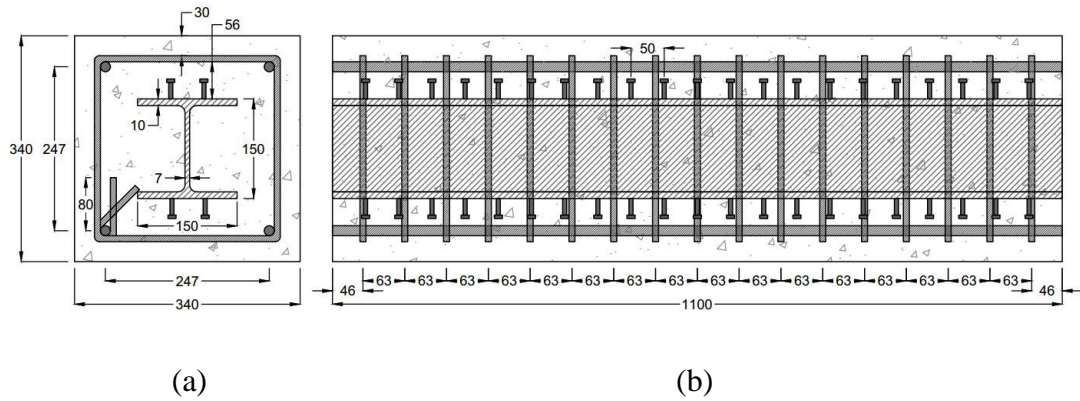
Reinforcement details of Ws-63, Ws-63-E1 and Ws-63-E2 columns; (a) cross-section; and (b) longitudinal section (dimensions in mm).
